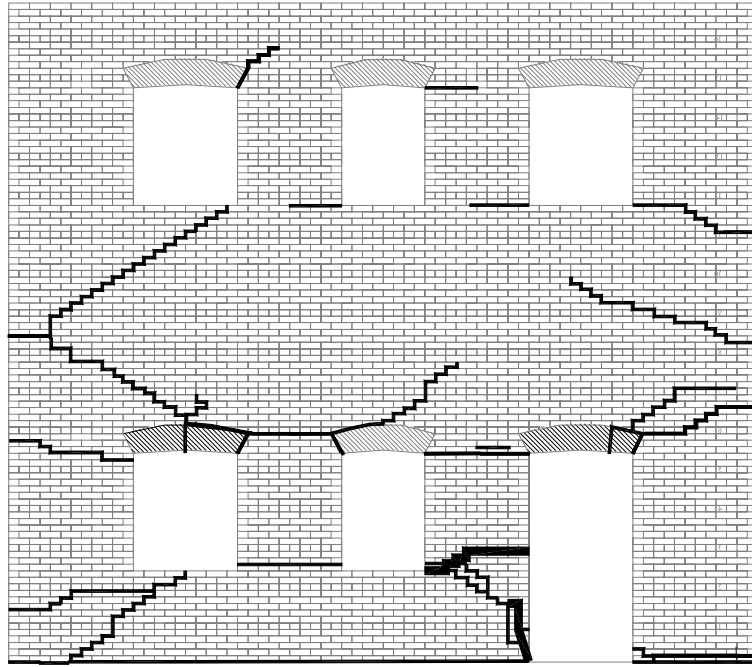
Crack pattern of Wall A following the Group 1 cycles.
